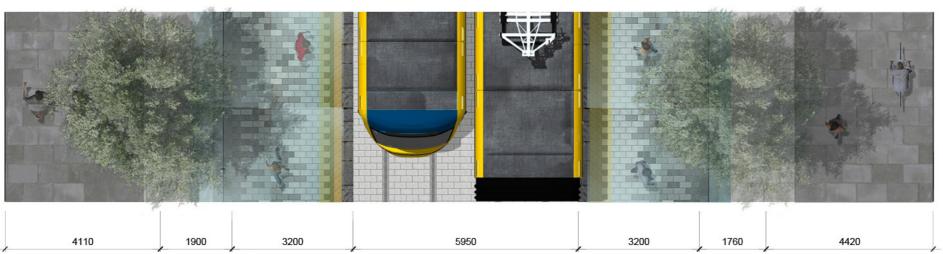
Partial plan and section of Britomart stop looking north towards Britomart
